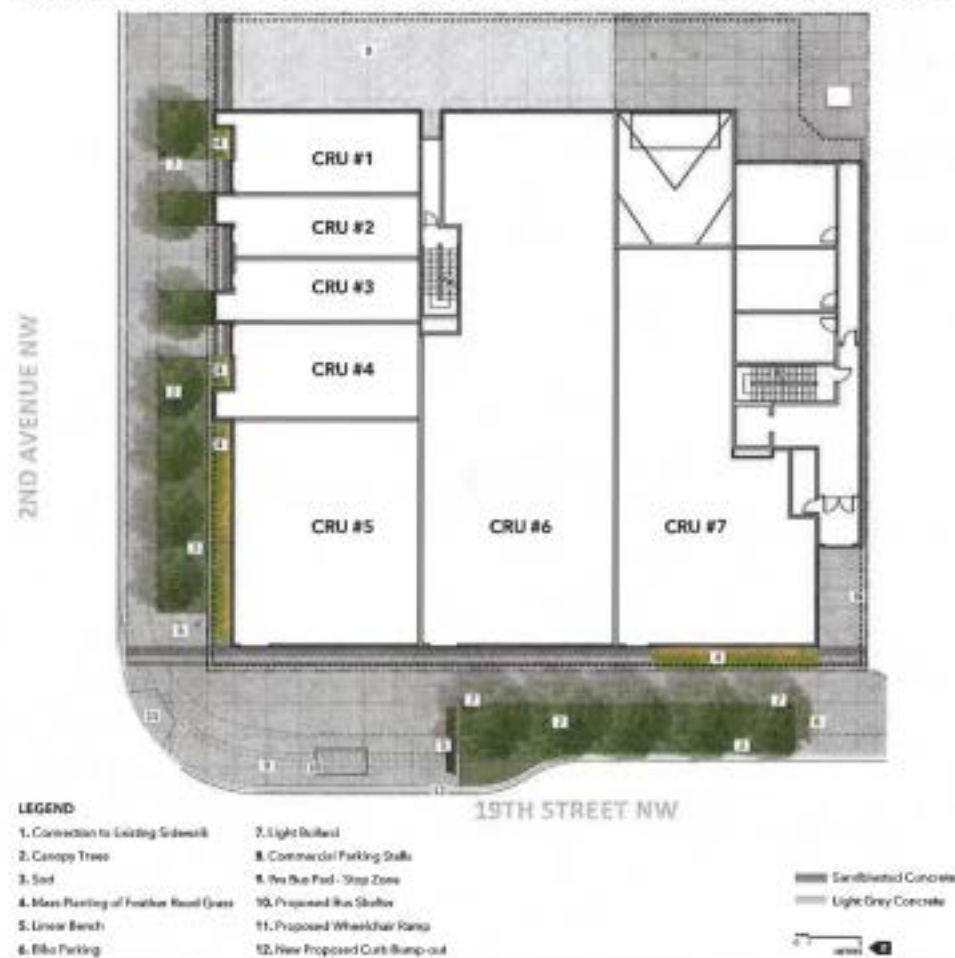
LEVEL ONE LANDSCAPE PLAN
